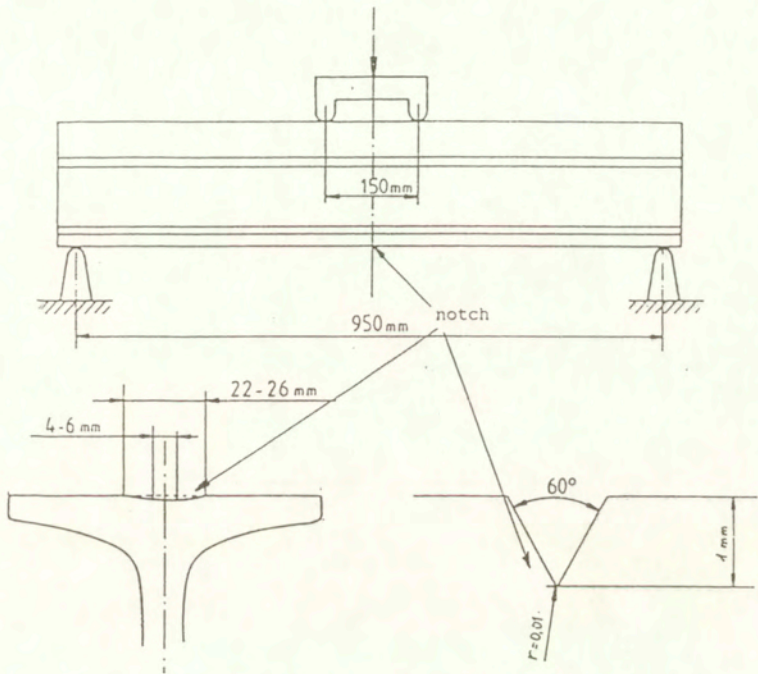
Dimensions of the section of the rail with a notch subjected to bending fatigue test
